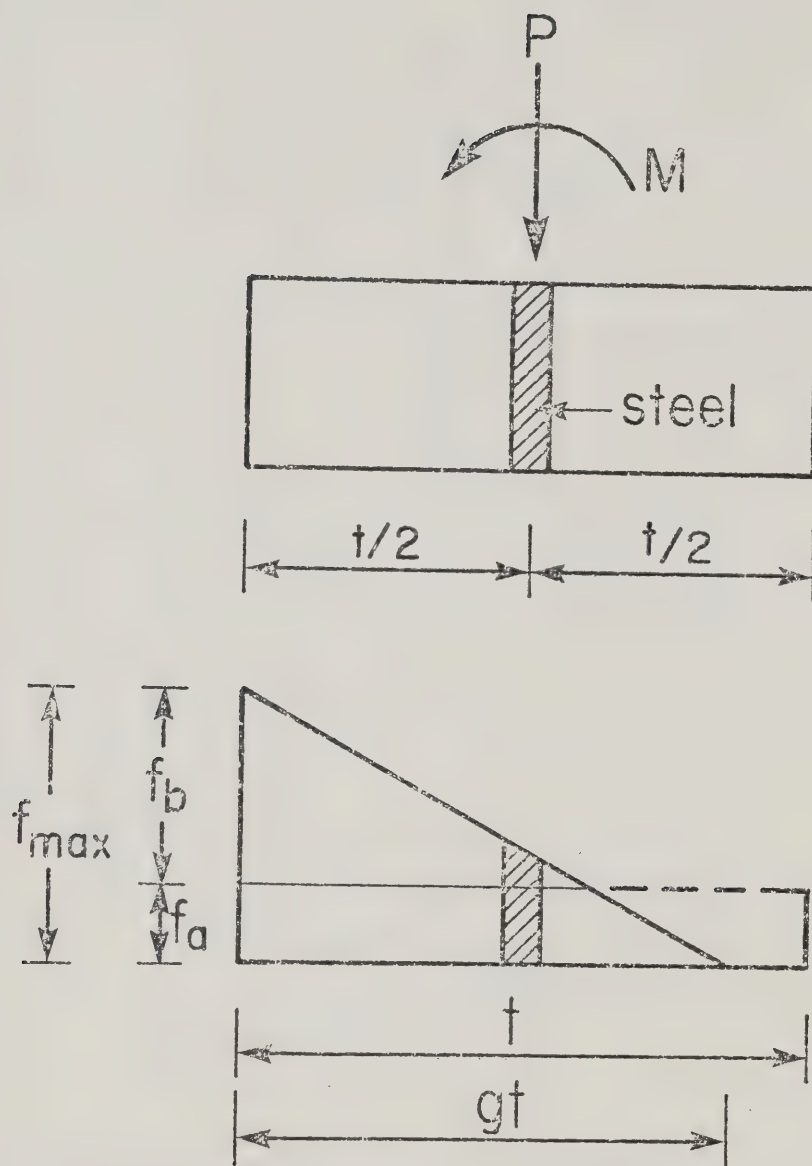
Compression on Part of Cross-Section of Reinforced Wall with Steel in Compression
